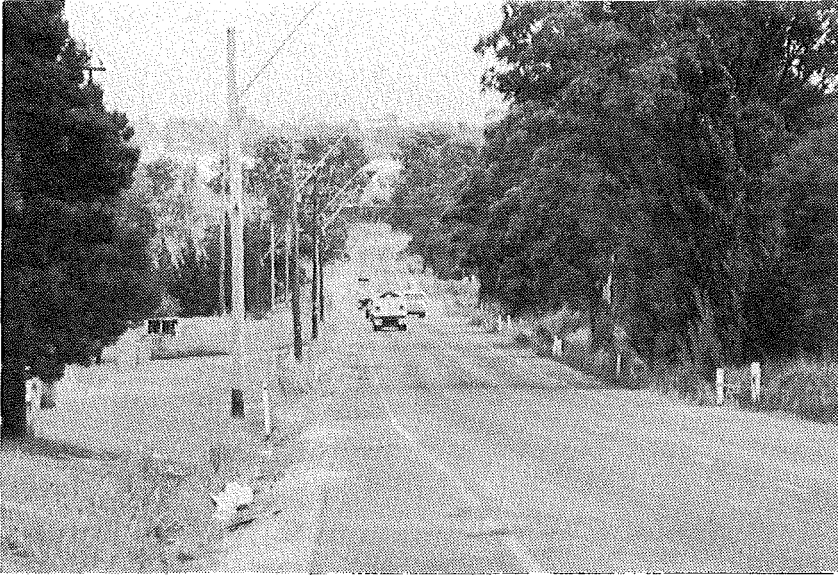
Uneven pavement and damaged shoulders on Windsor Road.
